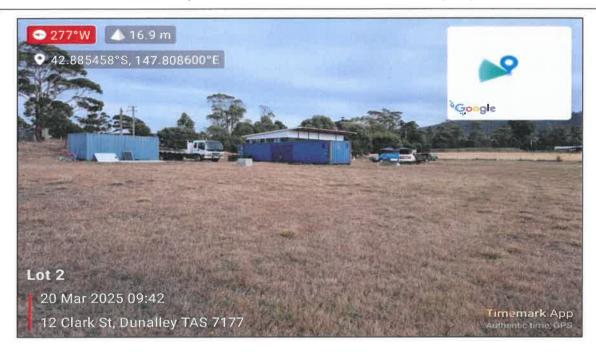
West from proposed building area on proposed Lot 2 towards existing dwelling on Lot 1
